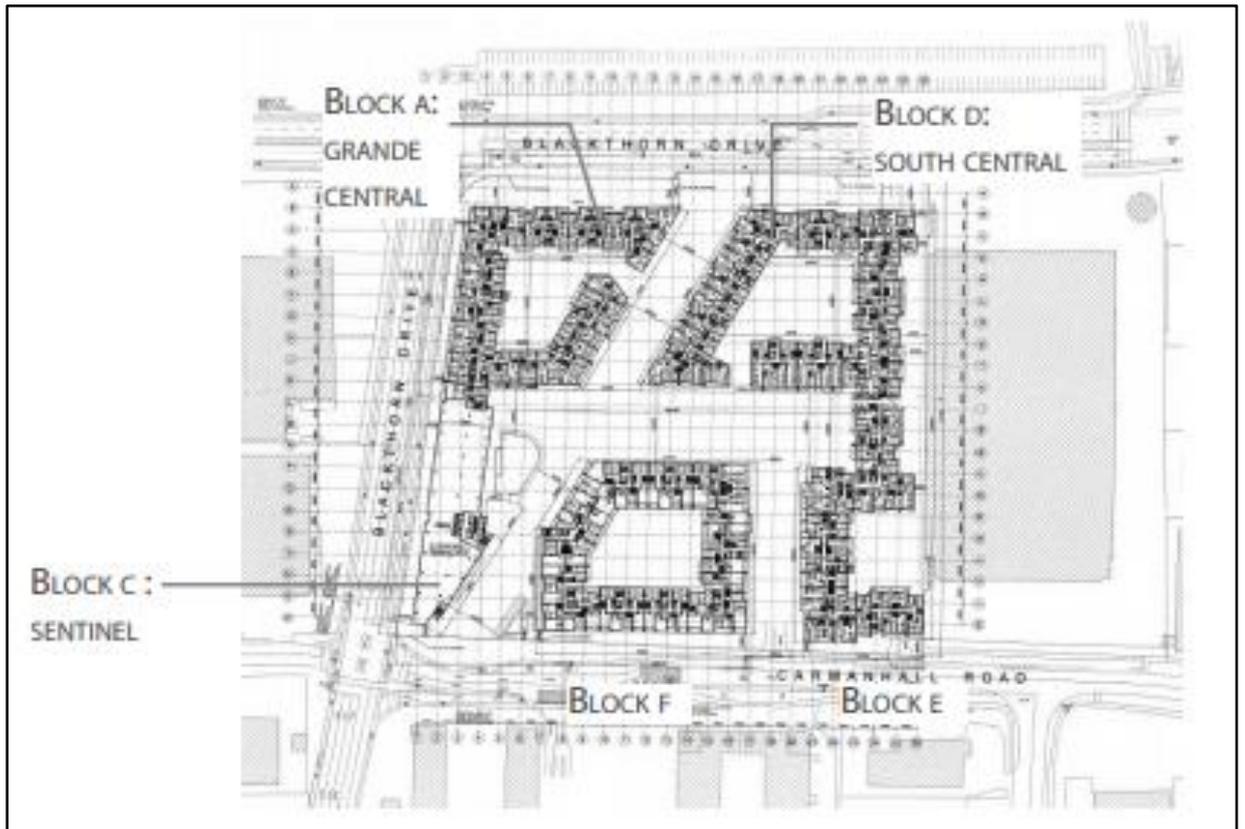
Extract of Original HKR Scheme Masterplan, extracted from the Design Statement, prepared by TOT Architects.
